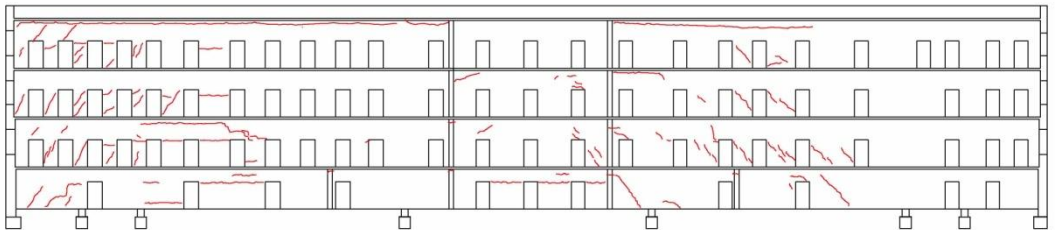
Cracks on the masonry of a long public (Hospital) building in Taranto (Puglia, Southern Italy) from foundations differential heave on swelling blue clays
